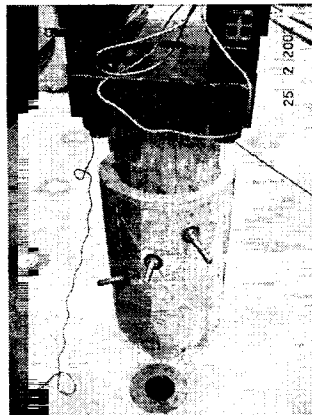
Undamaged Wood Pile Section Encased with FRP Composite Shell, Cement-Based Grout and Threaded Rods (Repair System D)
